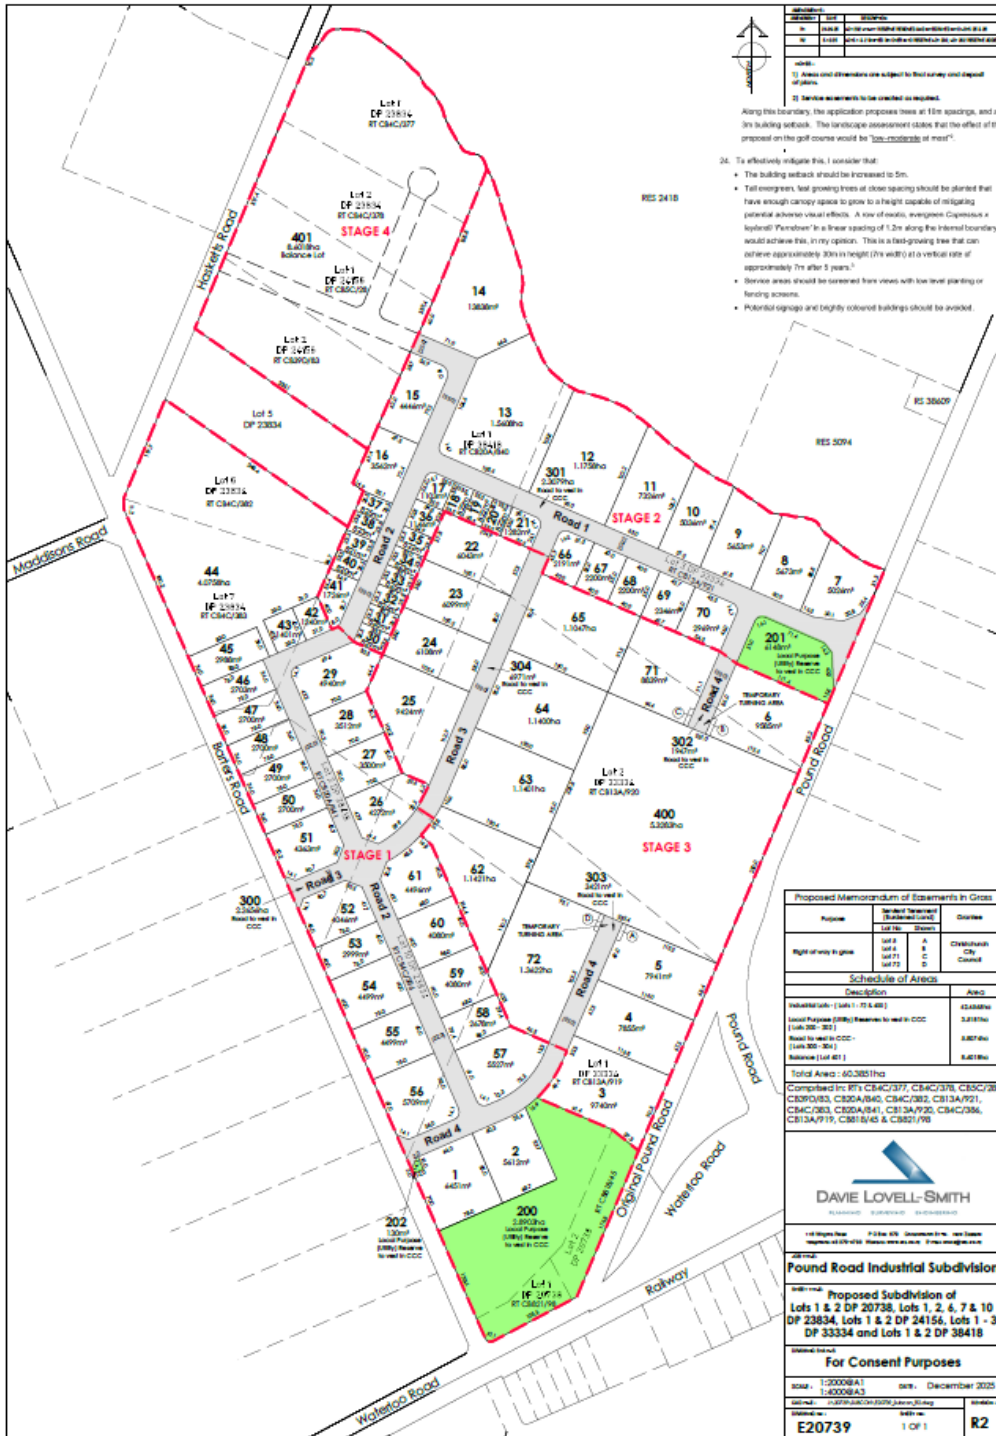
Subdivision scheme plan with the internal road numbers overlaid
